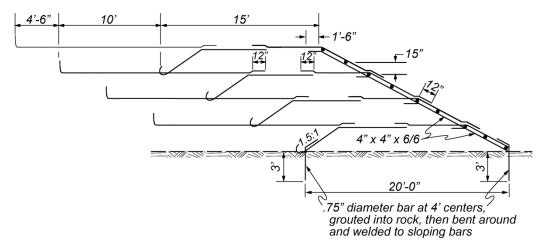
Reinforcement detail for the downstream toe—Des Arc Bayou site No. 3 (Courtesy of Henry, 1977, all rights reserved)..
